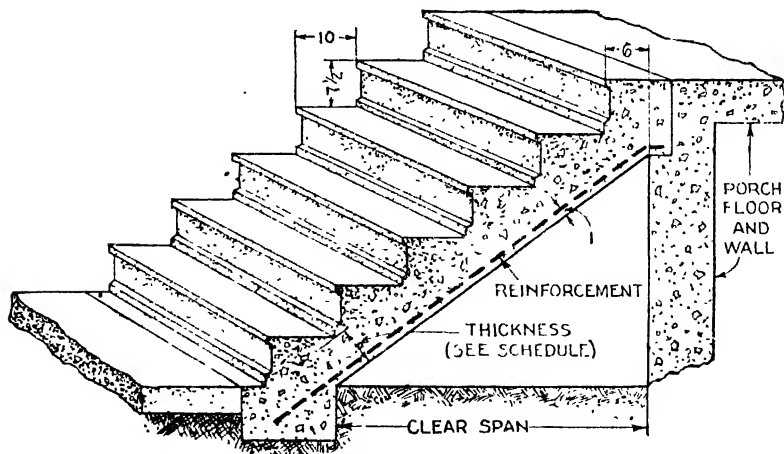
,773.—Self-supporting concrete steps after completion showing reinforcement.
